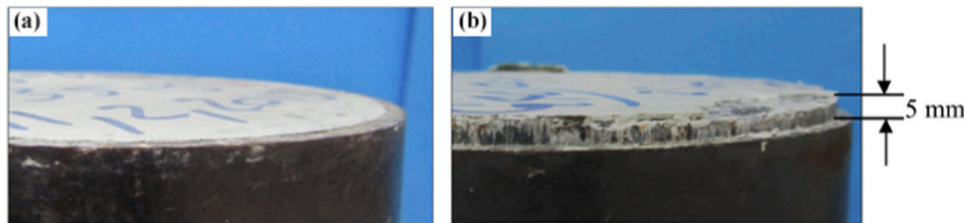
(a) Normal weight concrete filled steel tubes and (b) Oil palm shell lightweight concrete-filled steel tubes [149].
